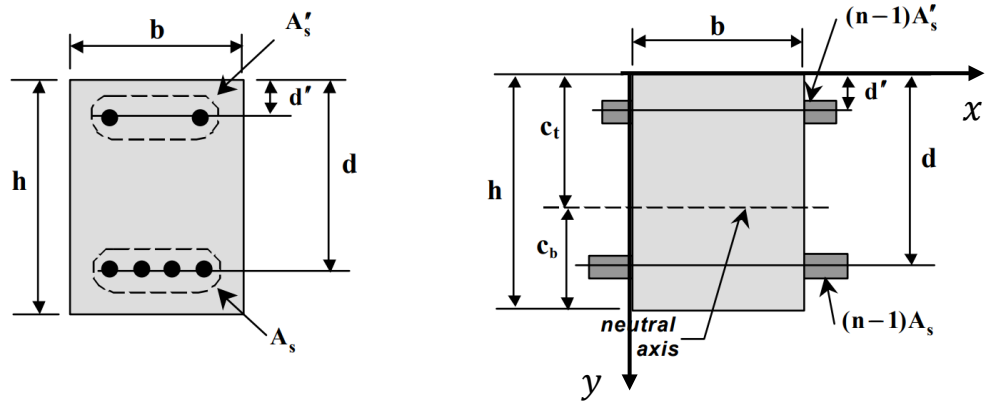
Transformation of the reinforced concrete cross-section to an equivalent concrete section [9]
